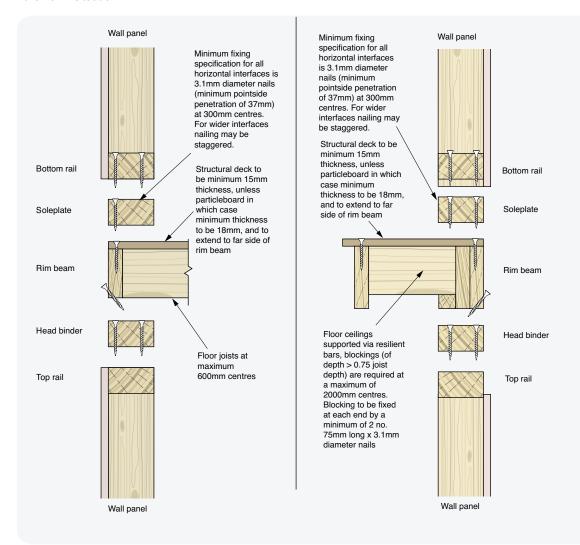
Extract from British Standards showing minimum sizes for wall-floor connections.
